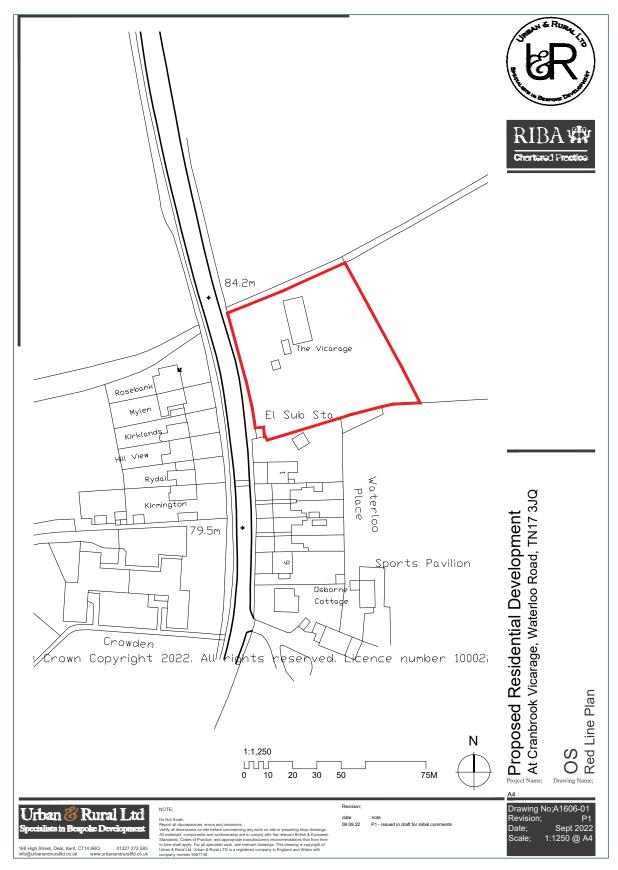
Site location plan showing application site boundary (Urban & Rural Ltd., Drawing no. A1606-01 P1, dated Sept 2022).
